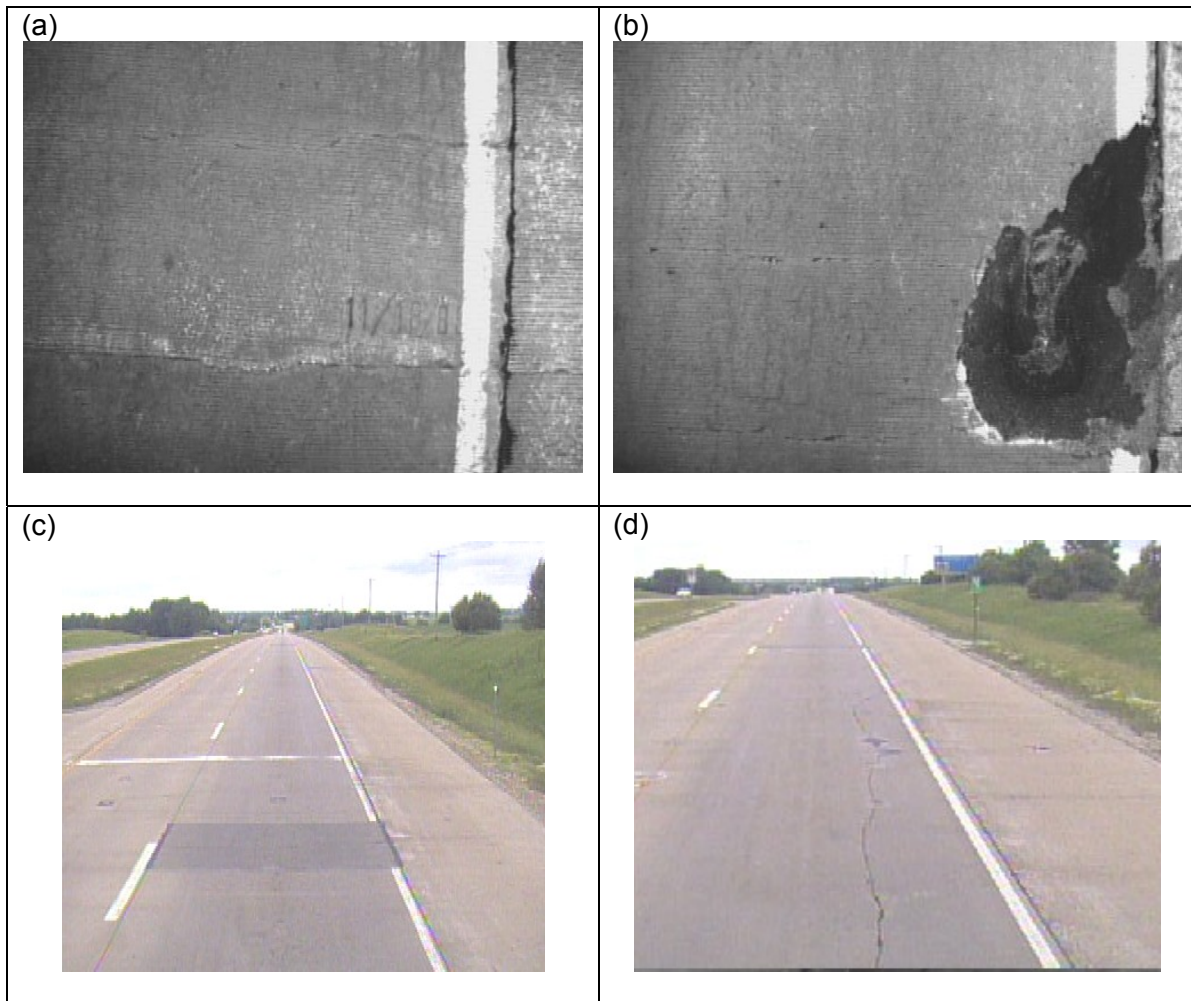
Observed CRCP distresses, including (a) traditional punchout, (b) asphalt patching, (c) concrete patching, and (d) extended longitudinal cracking.
